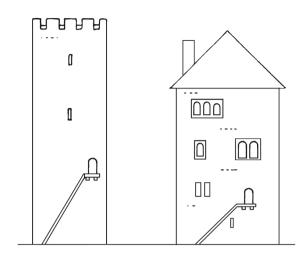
A schematic depiction of a bergfried construction: support beams (left) and a residential tower (right; after Krahe 2002b, Abb. 19; drawings: T. Korošec).
